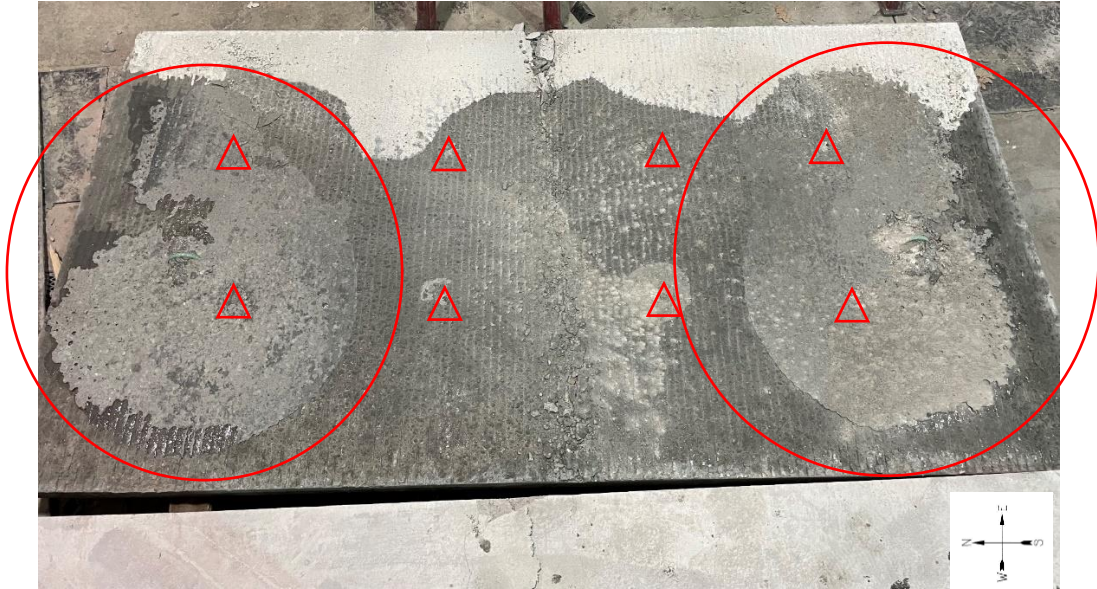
Distribution of epoxy after testing on the precast panel surface in plan view; triangles indicate location of epoxy injection sites.
